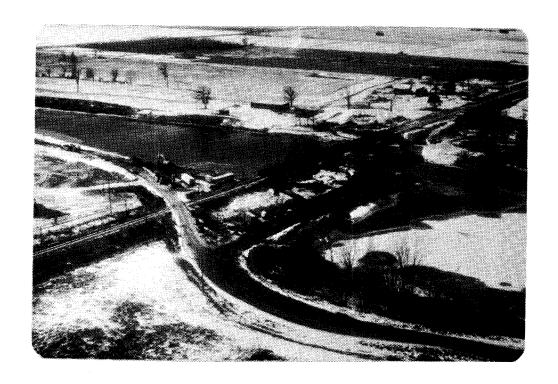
PLANTAGENET INTERIM FLOOD CONTROL PROJECT
